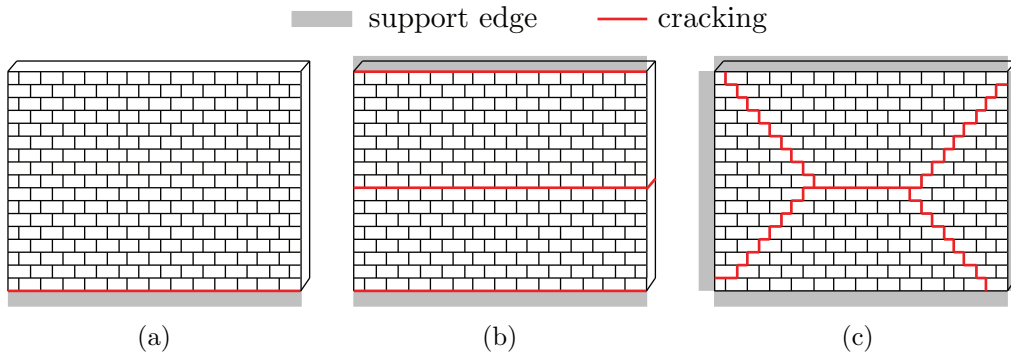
Typical out-of-plane failure cracking: (a) and (b) vertically spanning one-way walls and (c) two-way spanning walls.
